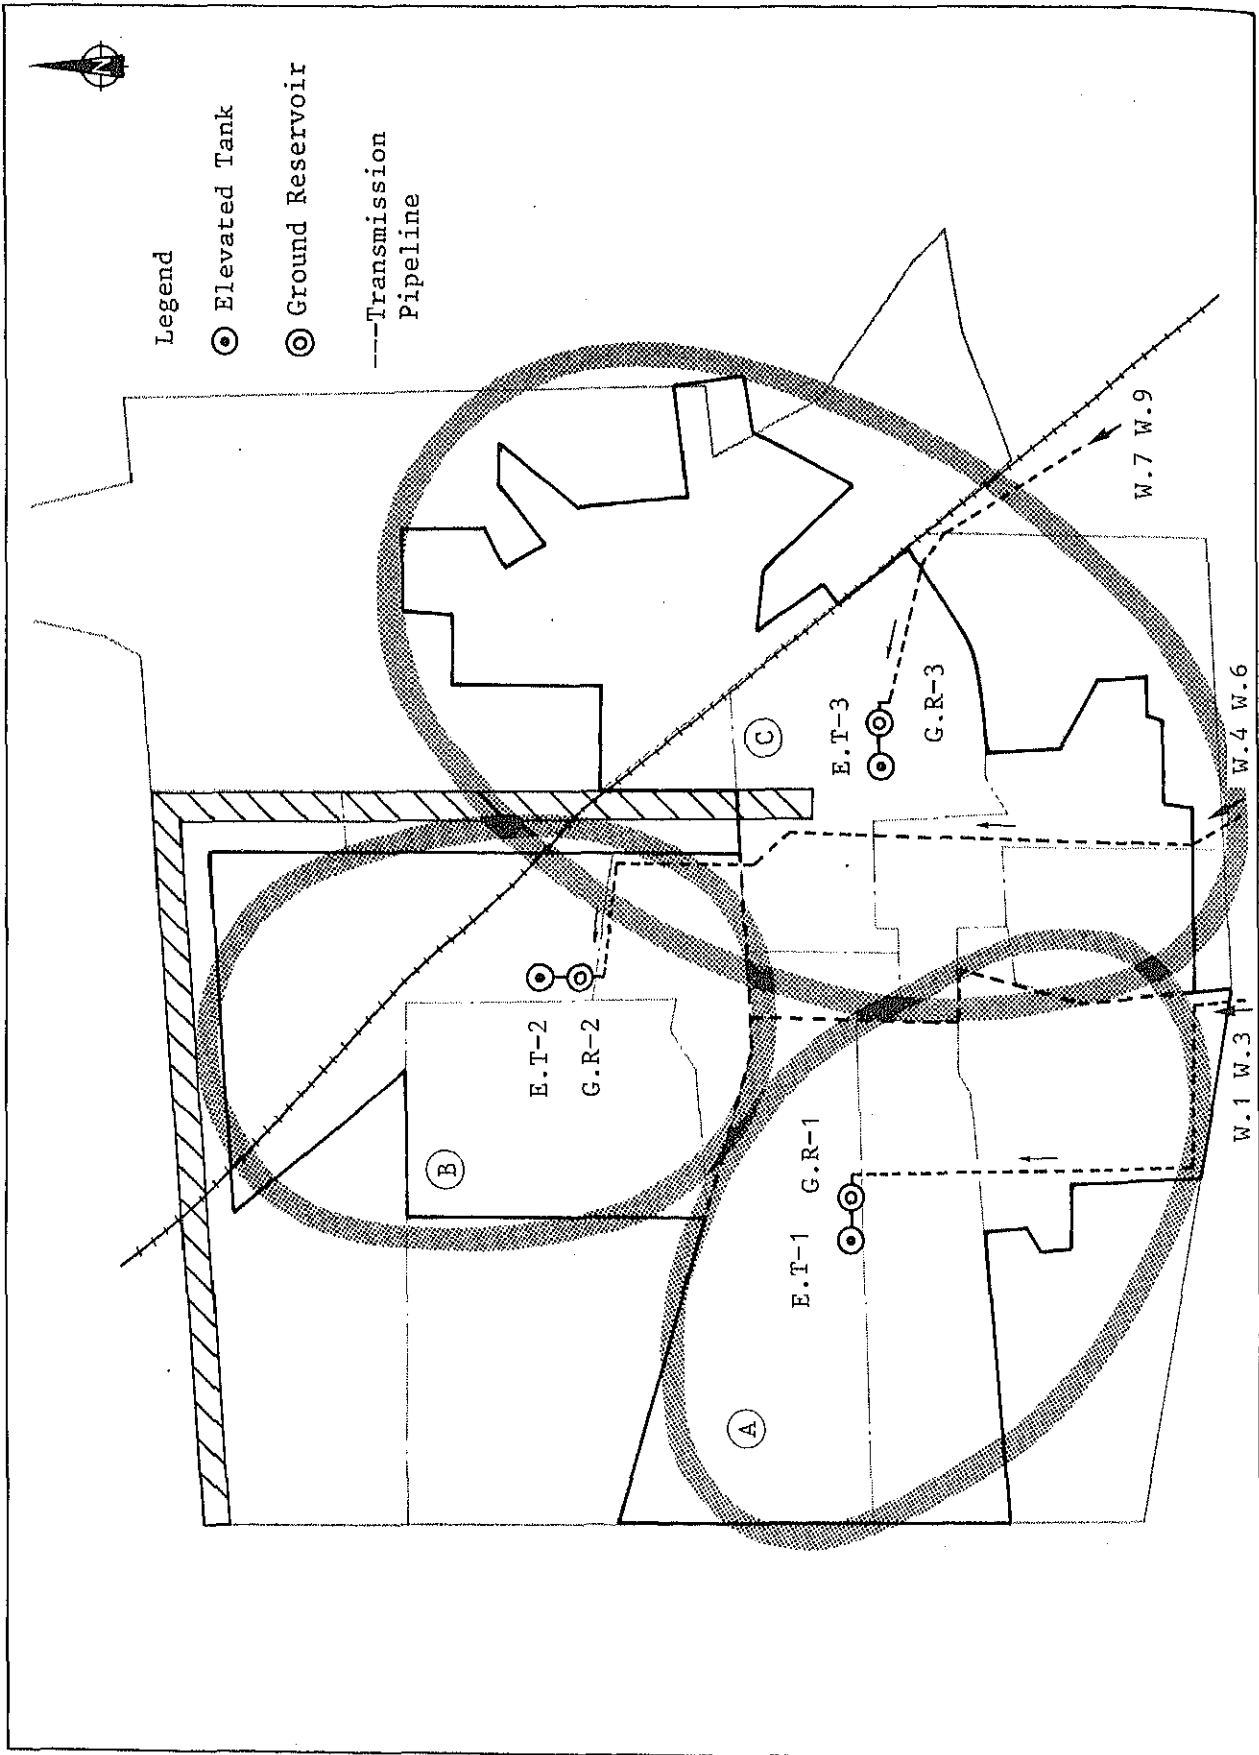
Layout Plan of Proposed Facilities
